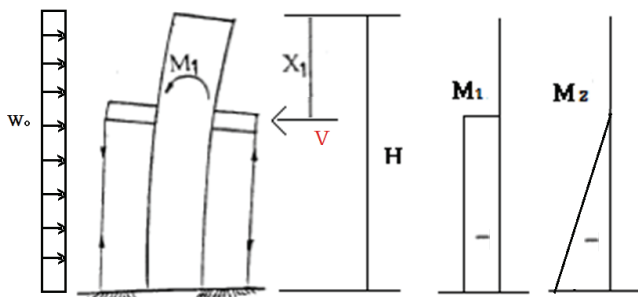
Reduction moment due to spatial structure compared with outrigger belt truss building
